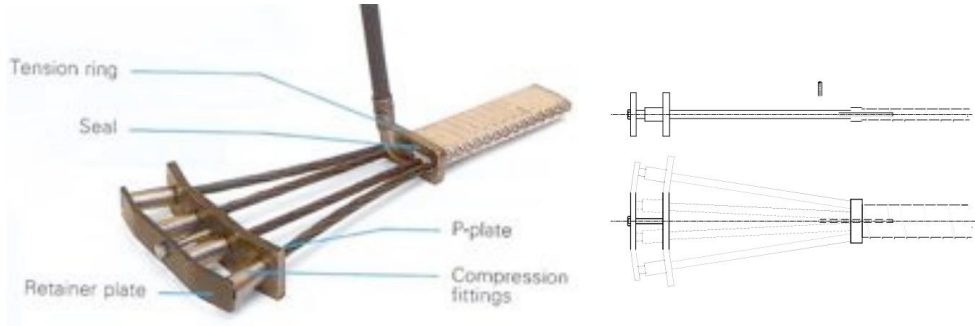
Elements for dead end anchorage with bearing plate.
